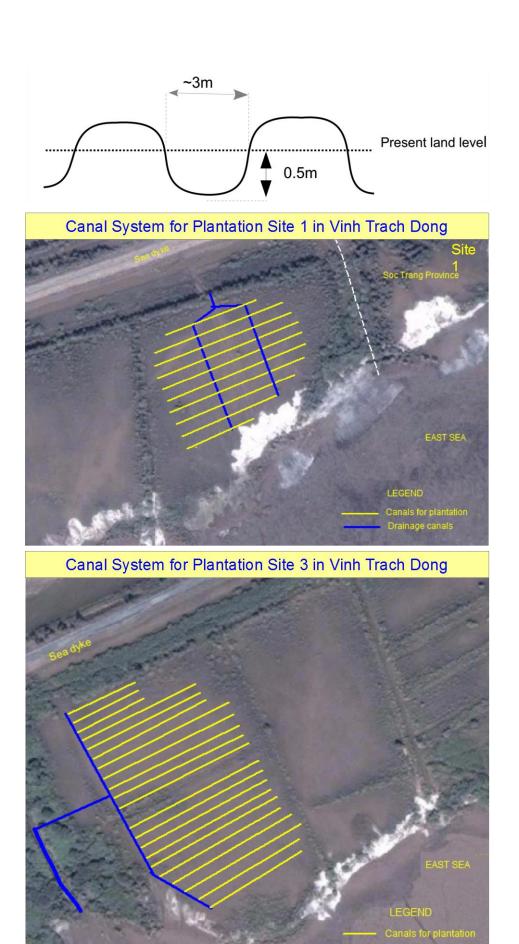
Design and layout of alternating canals and embankments at Site 1 and 3
